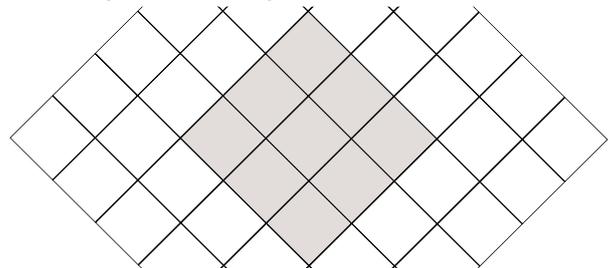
Diagonal Sheeting – Stack Bond Pattern
